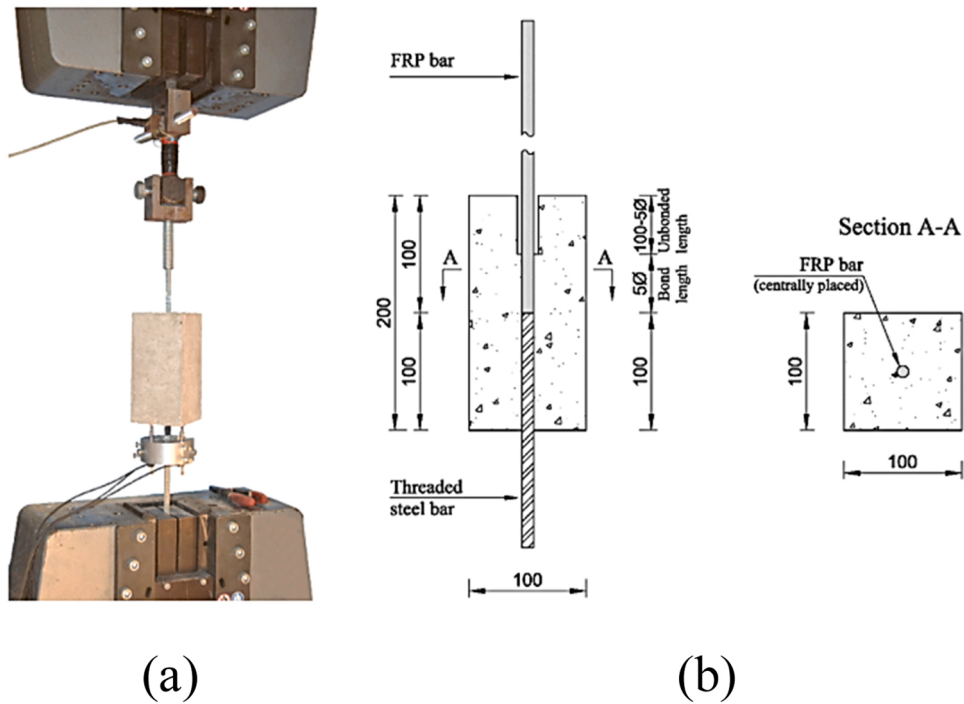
Configuration of direct tension (modified) pullout test [62]: (a) Real test set up; (b) Schematic representation (all dimensions are in mm).
